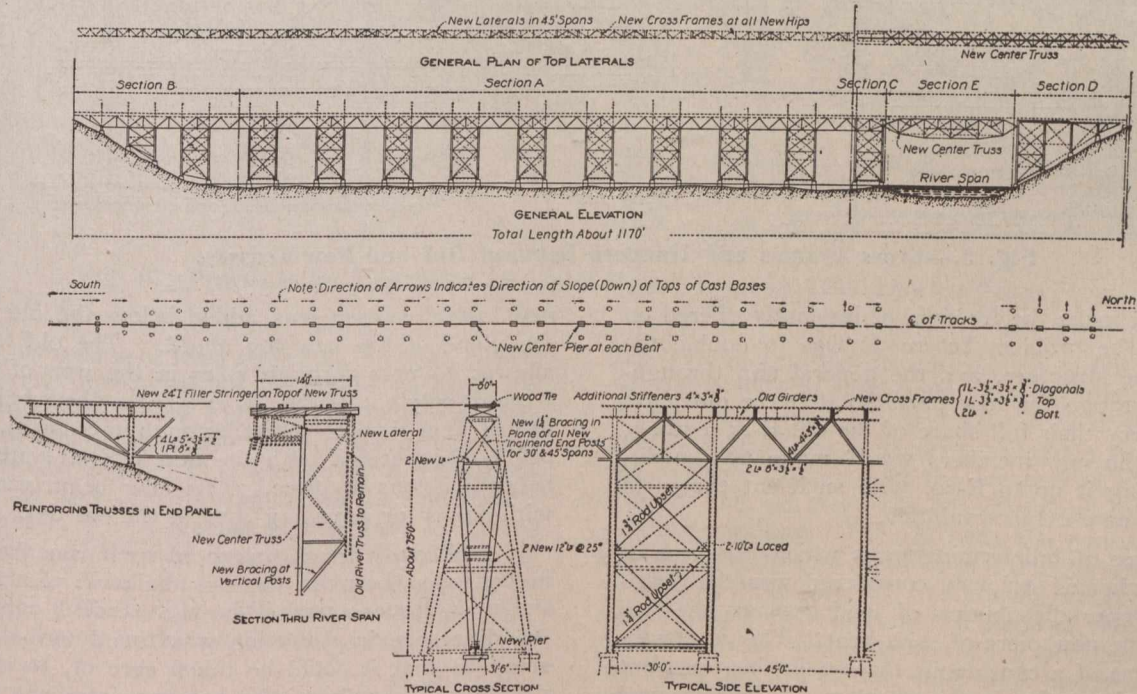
Elevation and Section Details of Bridge Before and After Reinforcement.
